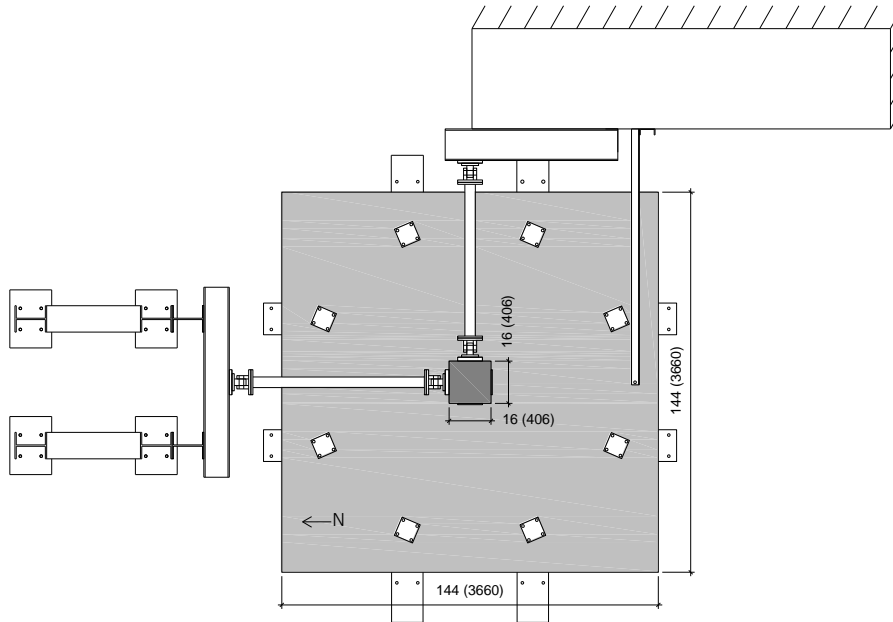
Specimen Geometry; Plan View [in. (mm)]
